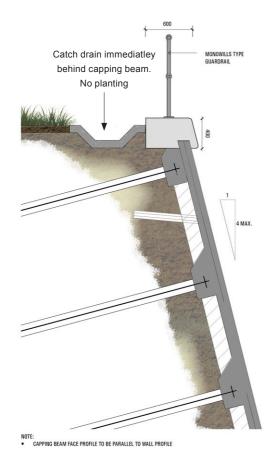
Typical Section: Soil Nail Cutting Treatment – no planting
